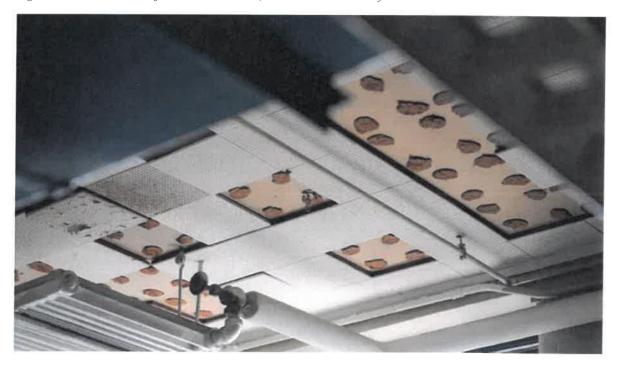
Many ceiling tiles have collapsed due to water damage.
